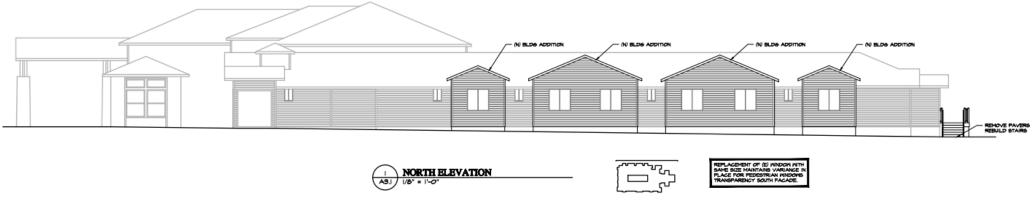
Proposed Modifications to North Elevation – Not to Scale
